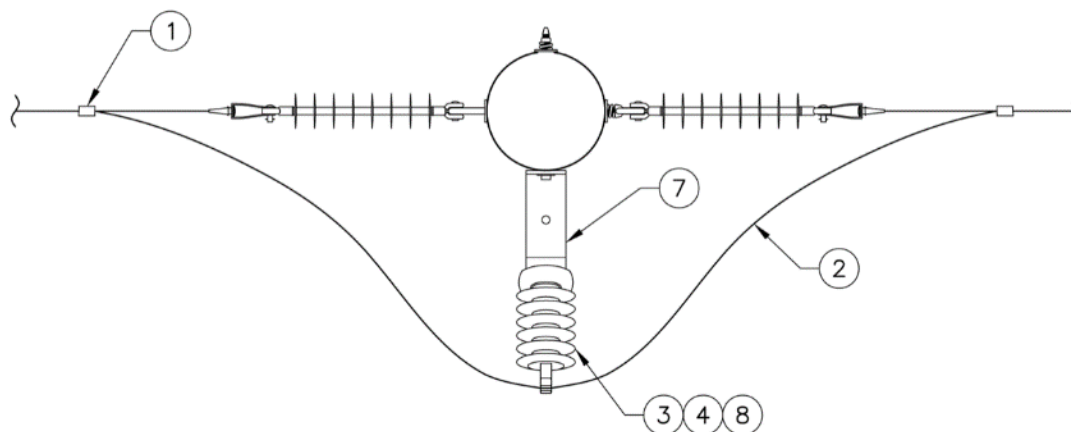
Single-Phase Single-Gain Double Deadend 0°–100° Side Mount Jumper, Top View
